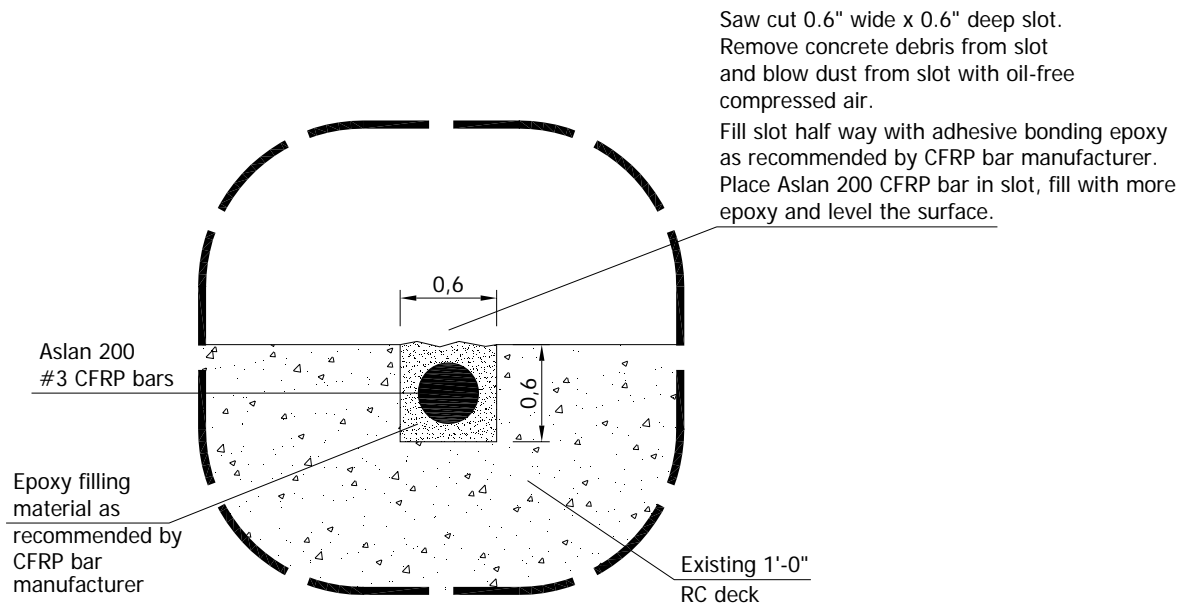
Detail 2 (see Figure 3) (Measure in in., Not to scale)
